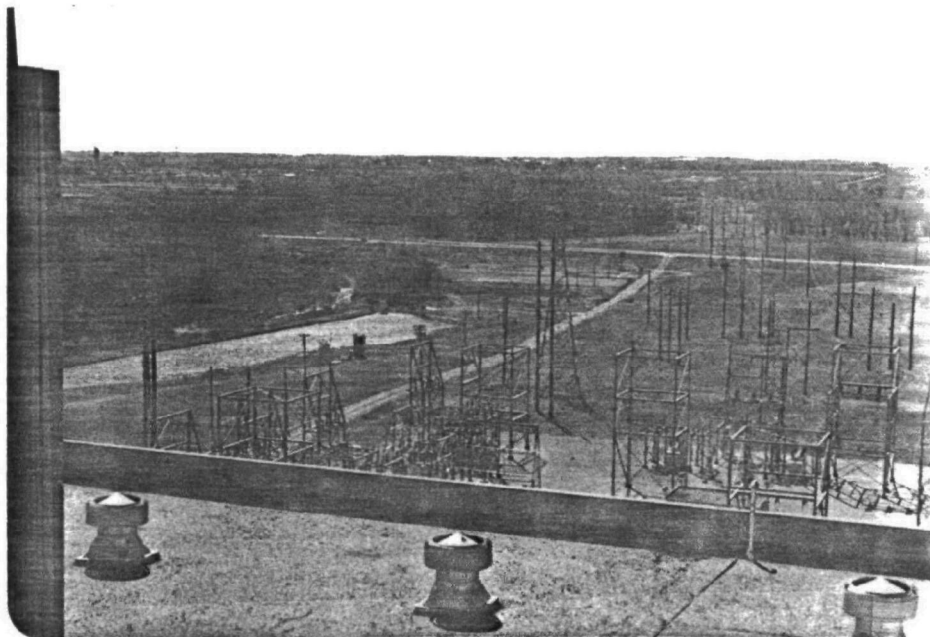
View from the boiler house roof looking southeast. A portion of a switchyard is shown in the foreground of the photo. The ash pond is shown in the left-center and the surrounding terrain is shown in the background of the photograph.
